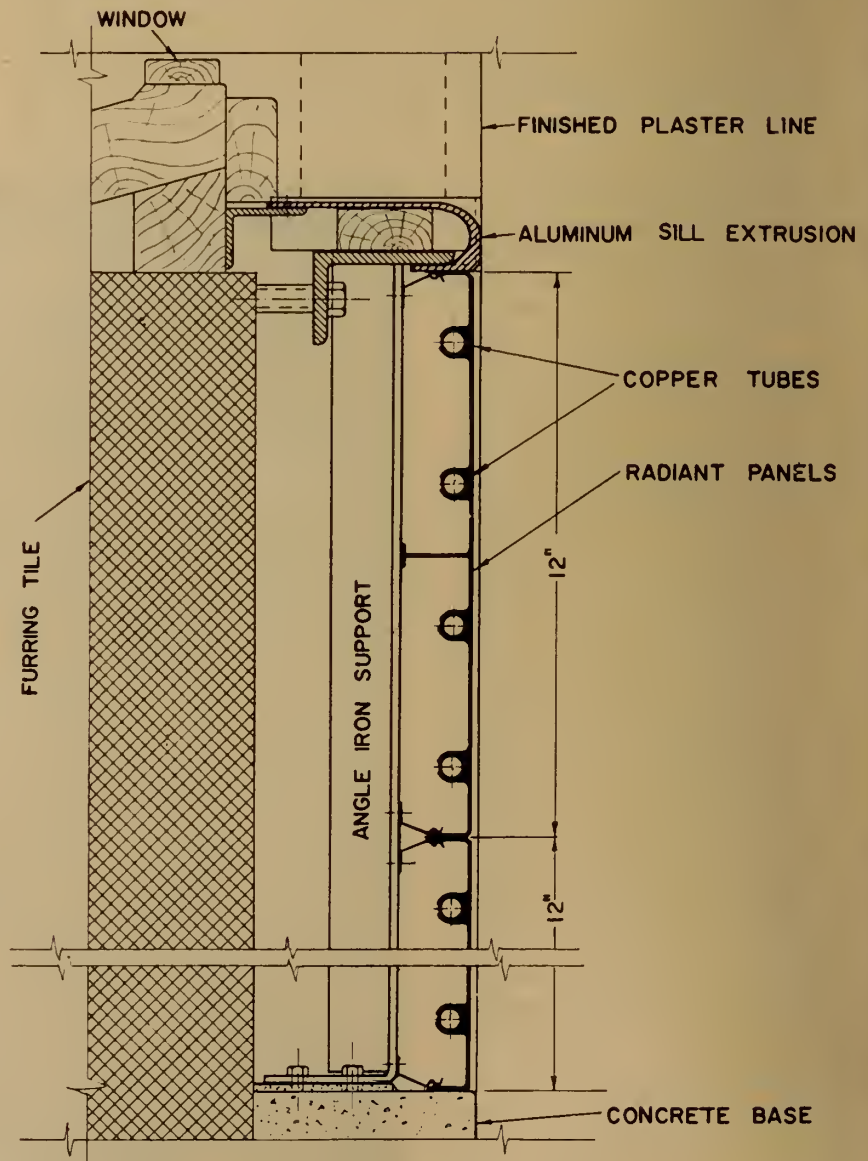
Section through radiant panels of a typical sill panel installation in Dominion Textile Building.
